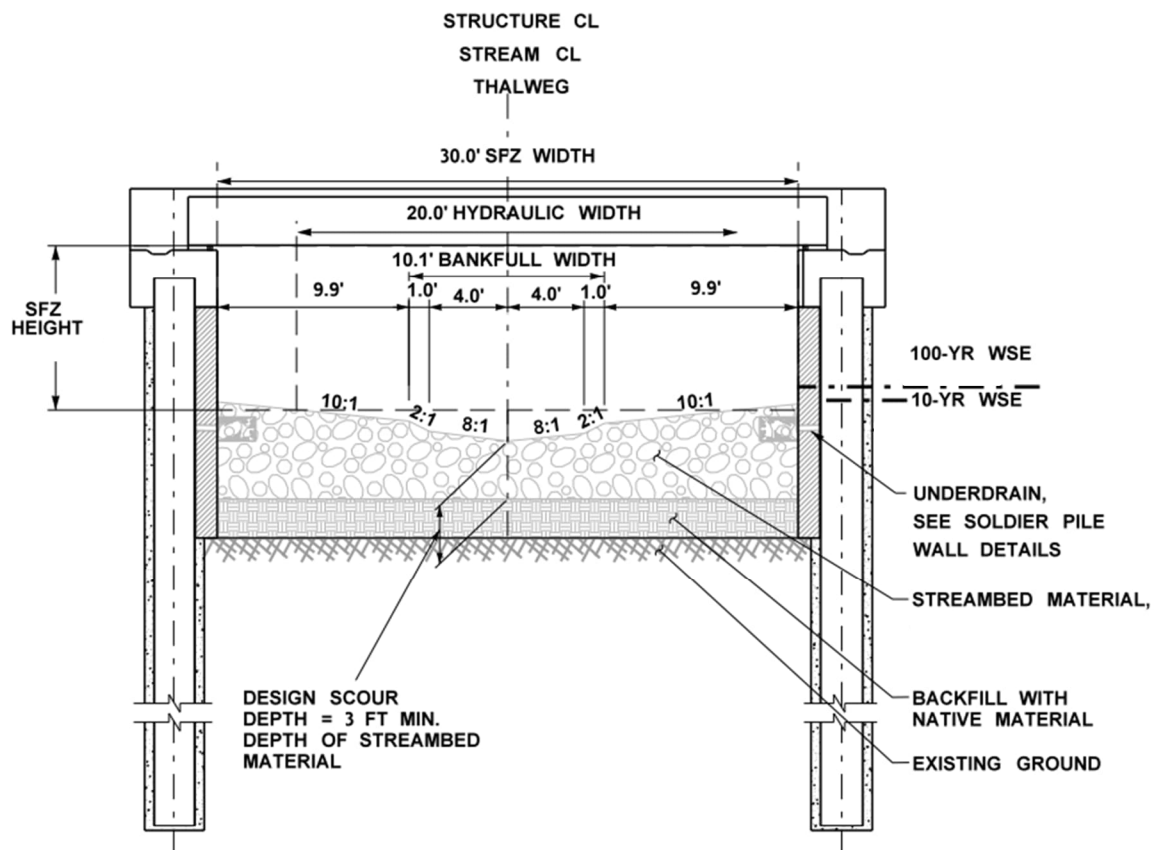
Illustration of minimum hydraulic opening and structure free zone
